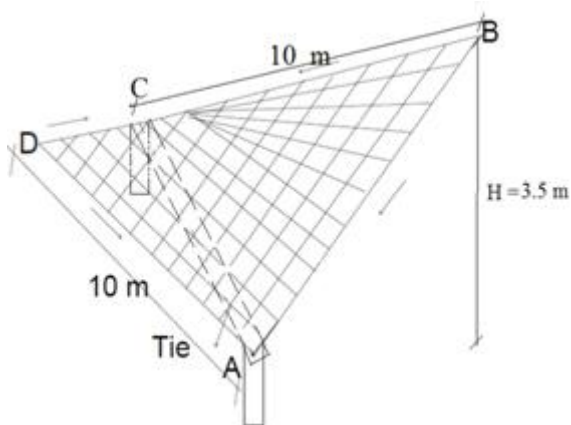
Layout of saddle type hyperbolic paraboloid shell roof
